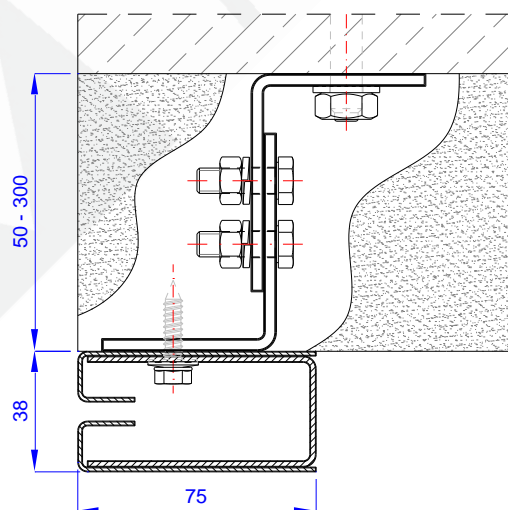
Fire protection curtain door MARC-K, corridor (niche) mounting
